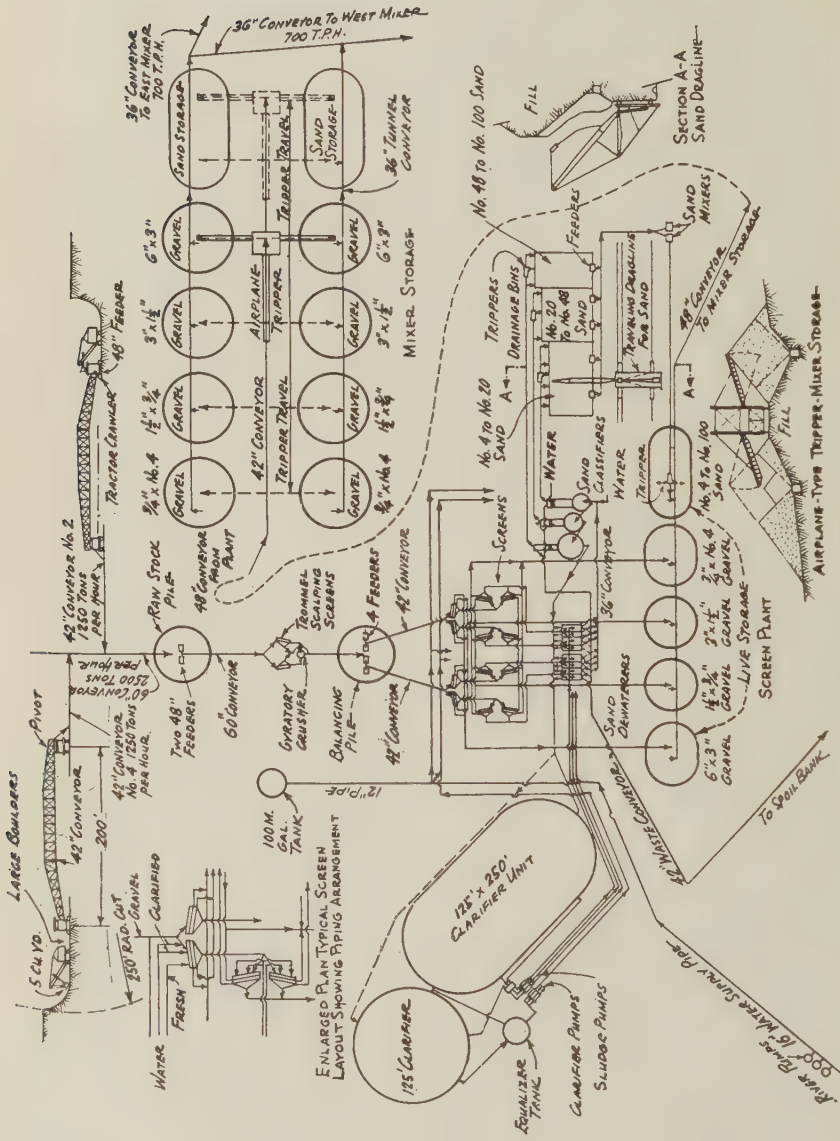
FLOW SHEET OF MATERIAL HANDLING
